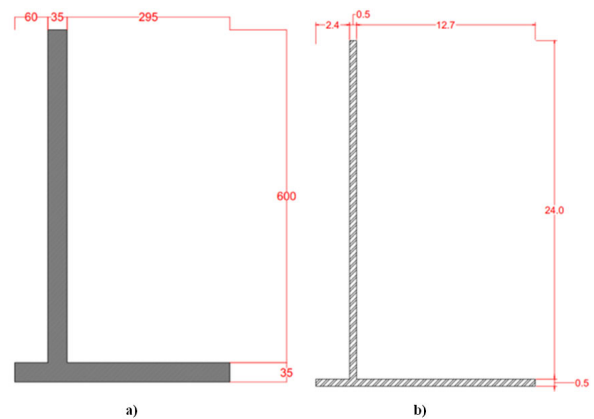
Retaining wall models, a) the prototype wall and b) the scaled wall.
